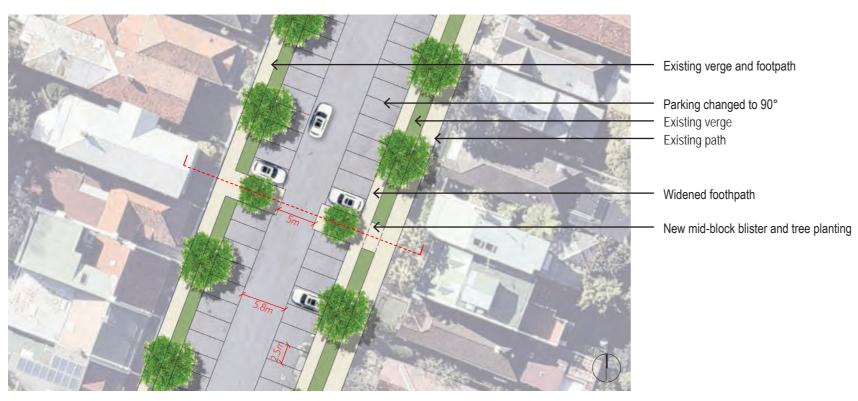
TYPICAL PLAN OF RECONFIGURED ANNANDALE STREET (not to scale)
